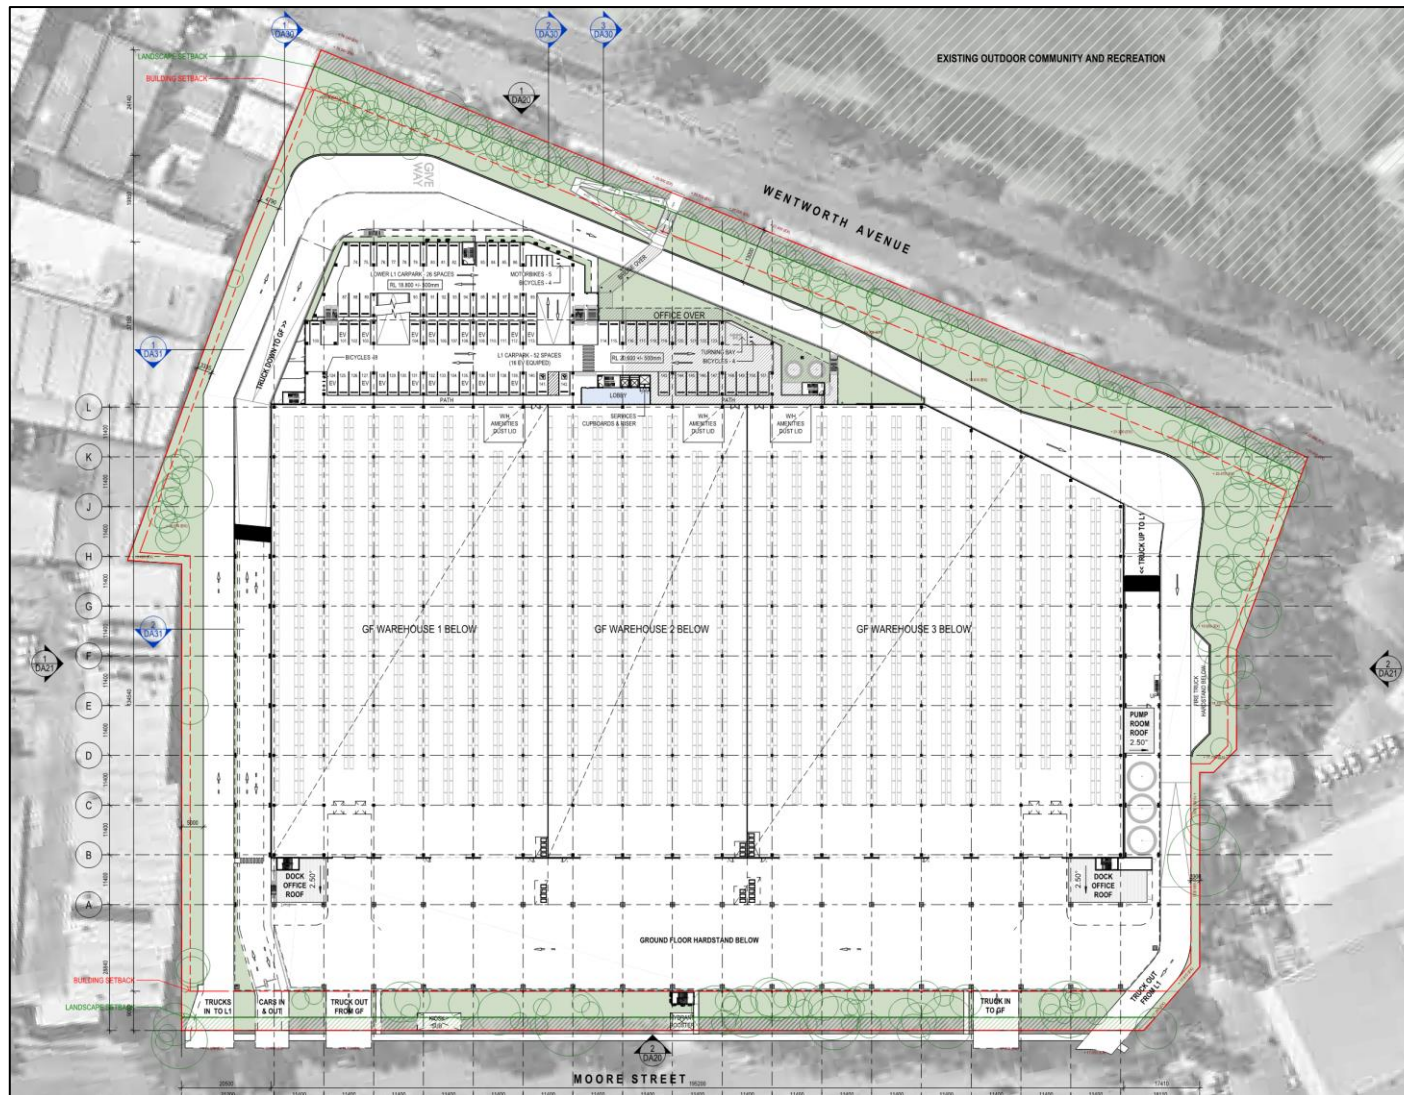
Level 1 Floor Plan (Nettletontribe Architects, 2024)
